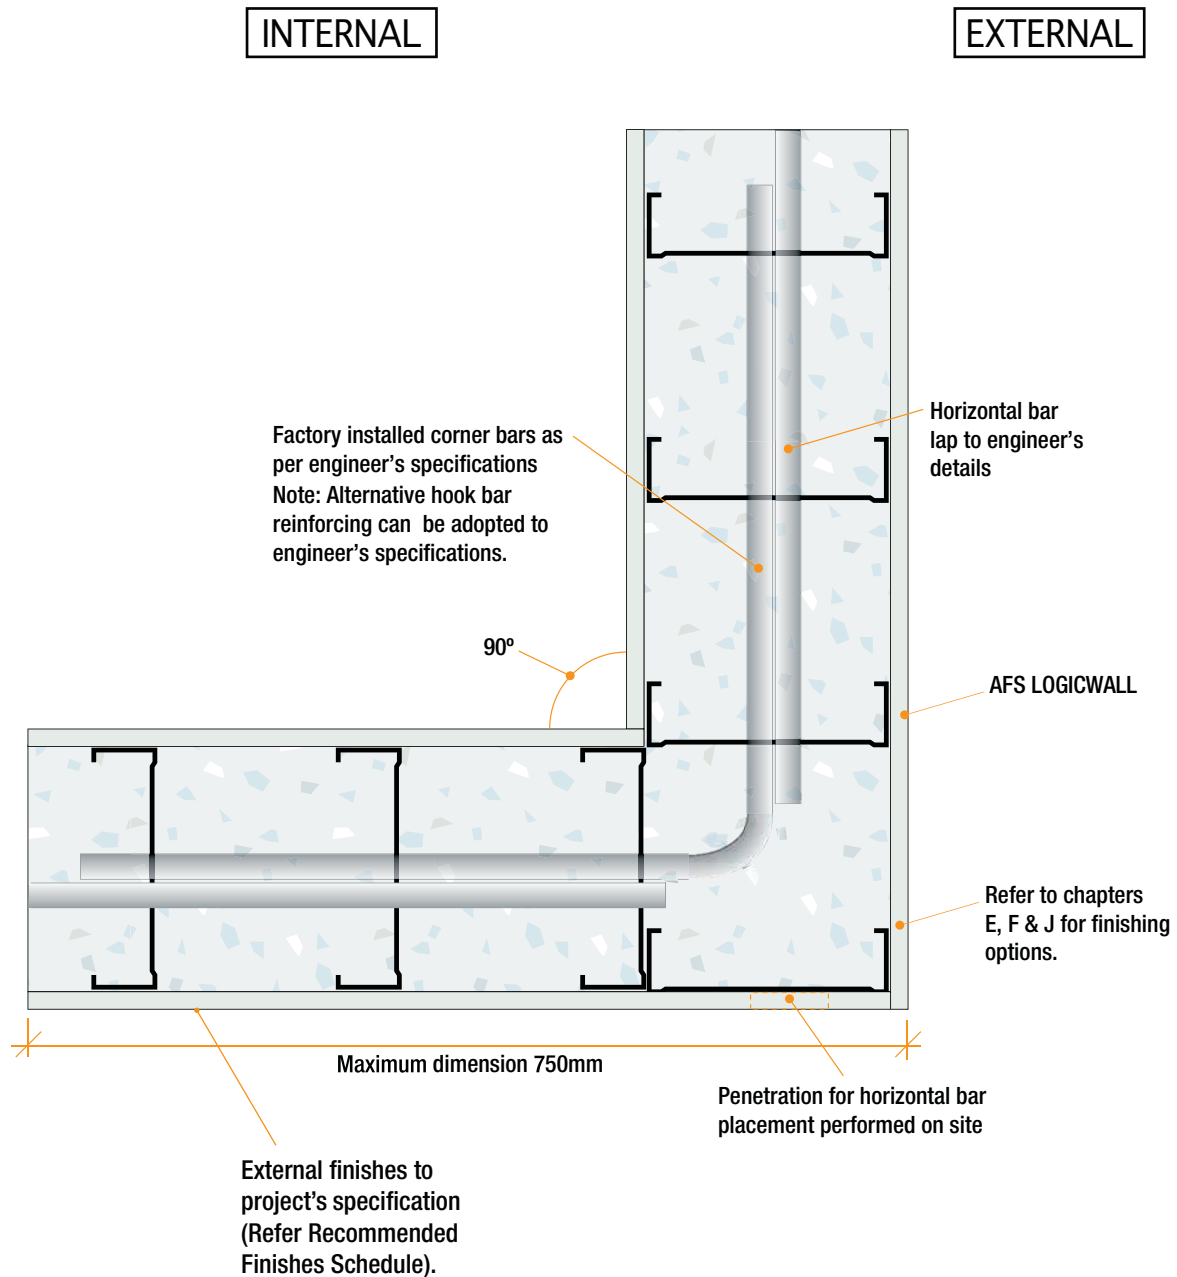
AFS Logicwall® Wall 90° Prefabricated Corner –
